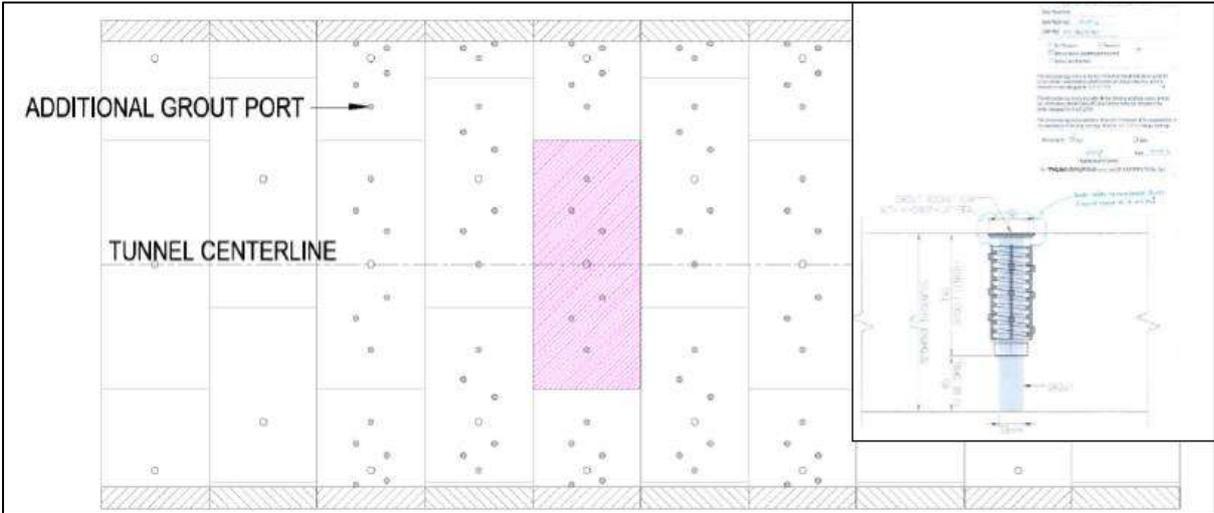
T211 Grout port arrangement, profile of bored tunnel
